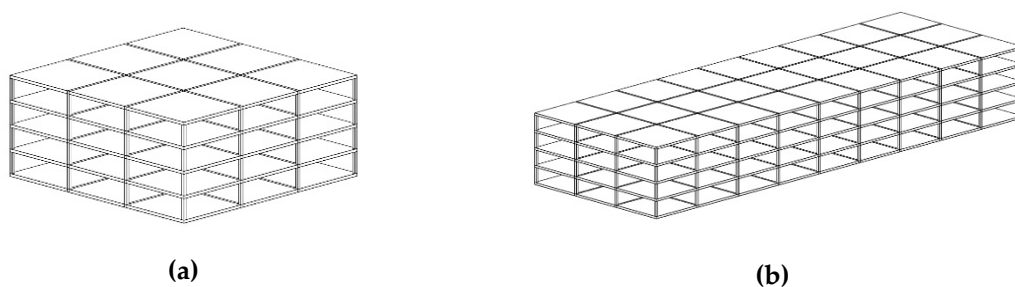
Prototype 3—Demountable: (a) the first configuration: mix using public facilities and parking, housings and offices; (b) the building extension.
